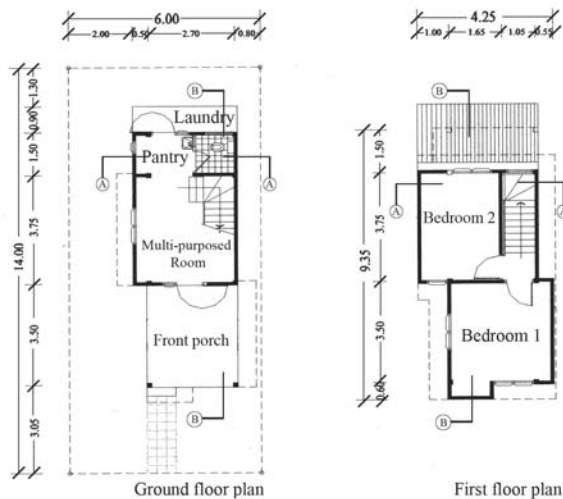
Typical floor plan of Baan Ua-arthorn house.
